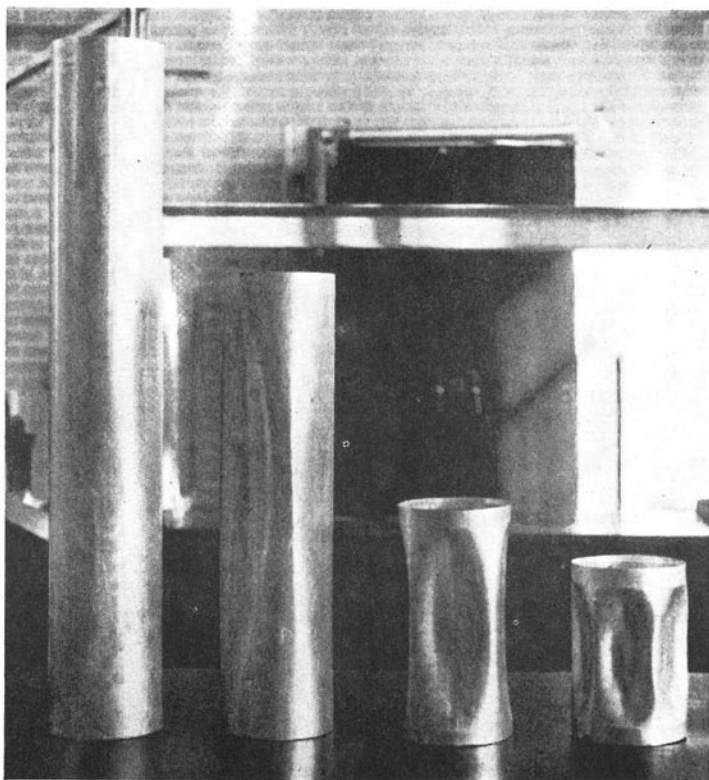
SPECIMENS 6, 7, 8, AND 9 AFTER TEST
